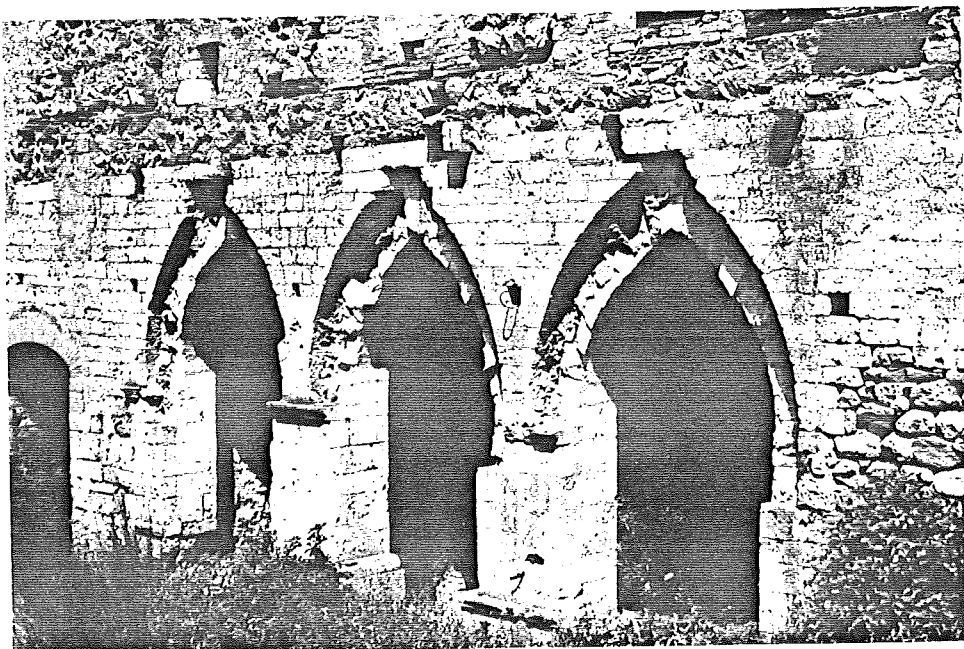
Gothic arcade (lacking voussoirs and keystones) of west facade of casa colonica (Appendix C, BUILDING PLAN, No. 8).
